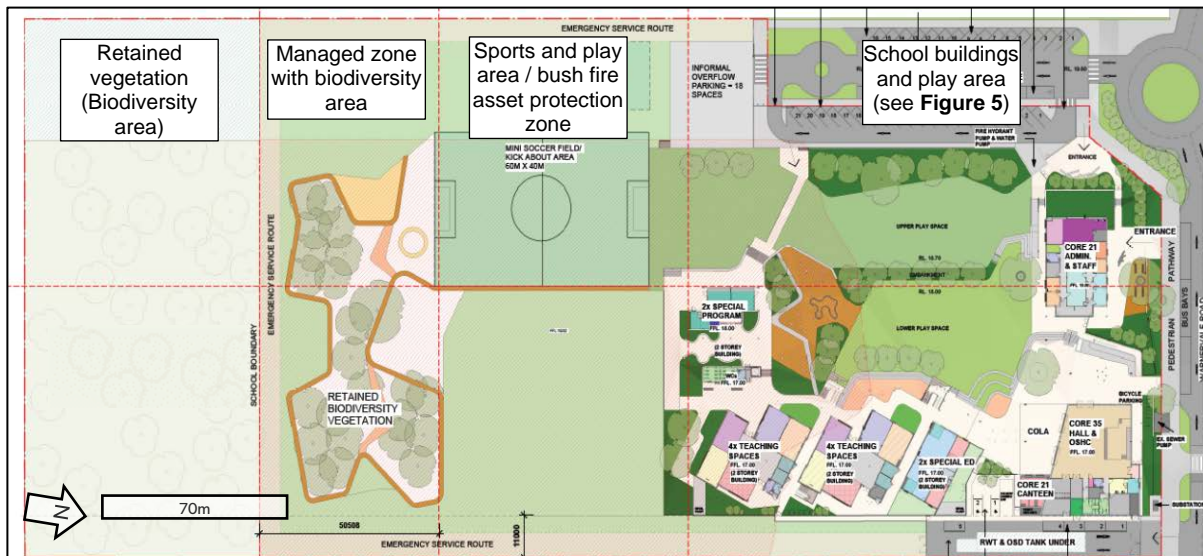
| Site plan (Base source: Applicant's EIS 2019)
